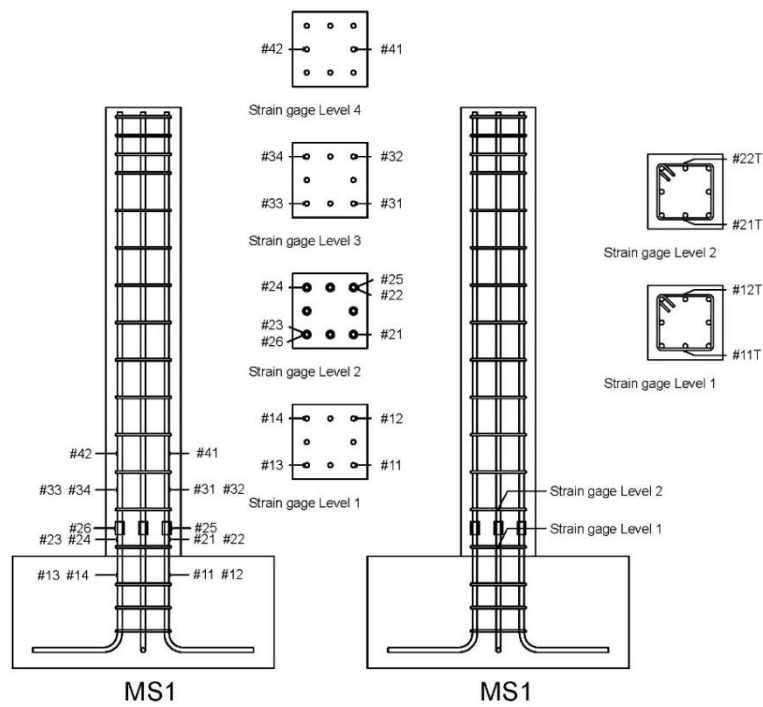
Detailing of strain gauge on reinforcements of MS1 column
